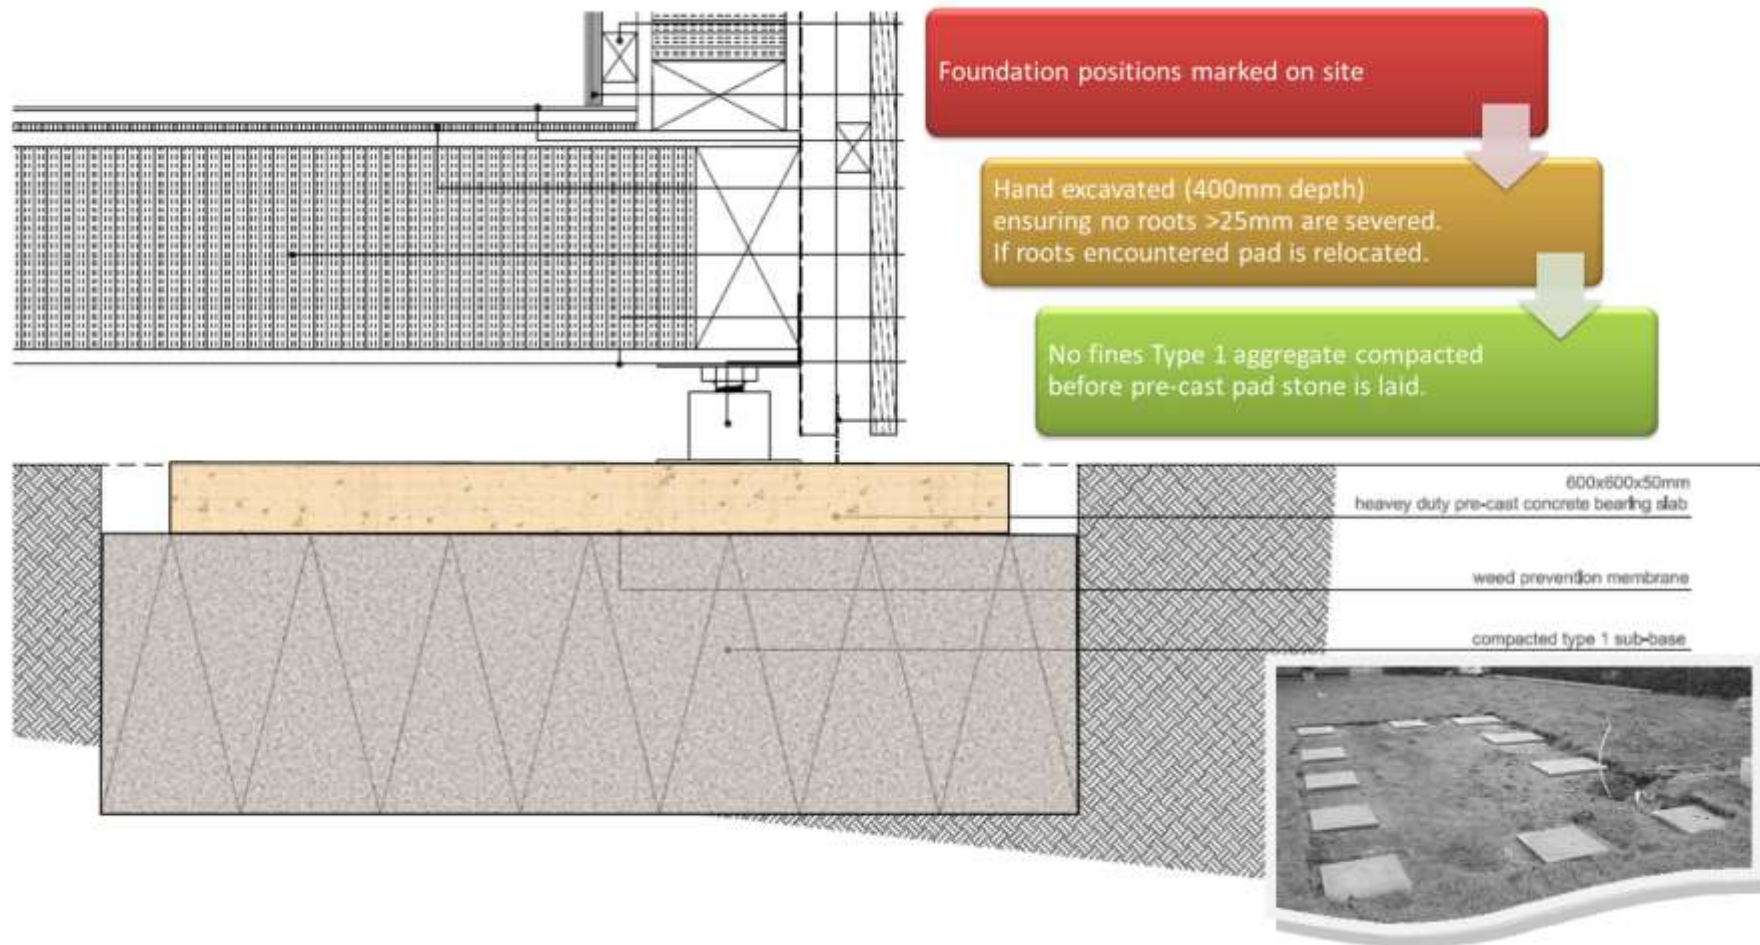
Pre-cast hand dug pad foundation with installation flow and image (bottom right) of typical installation
